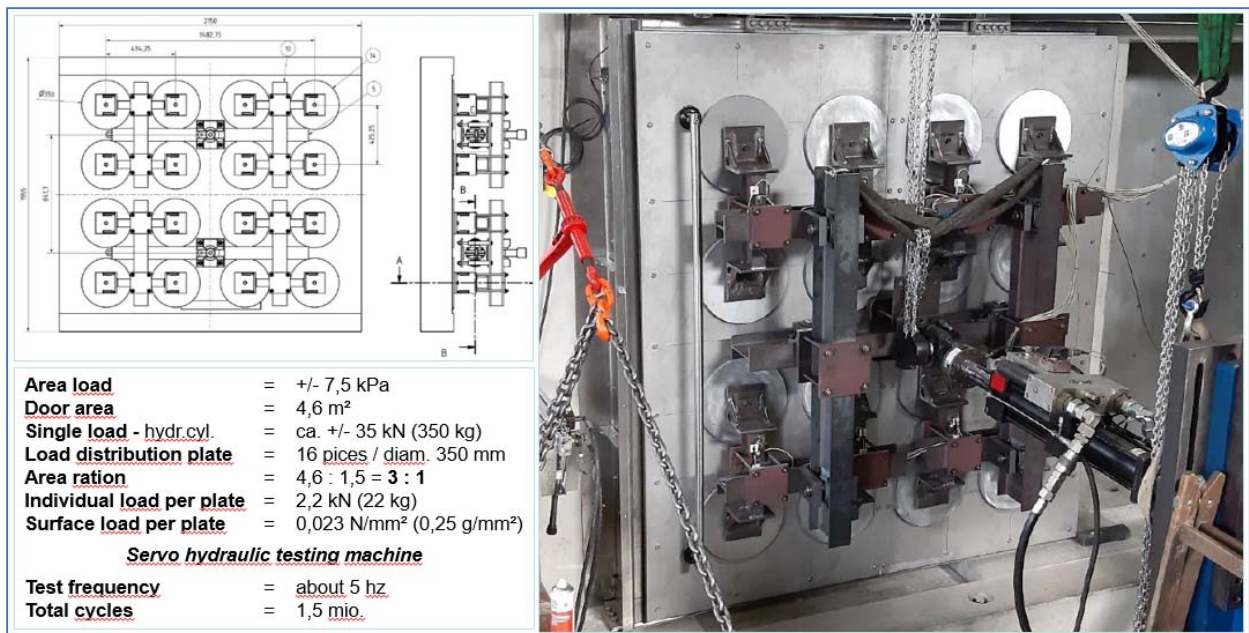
Test set up: concrete frame, sliding door, load transmission construction (servo-hydraulic testing device)
